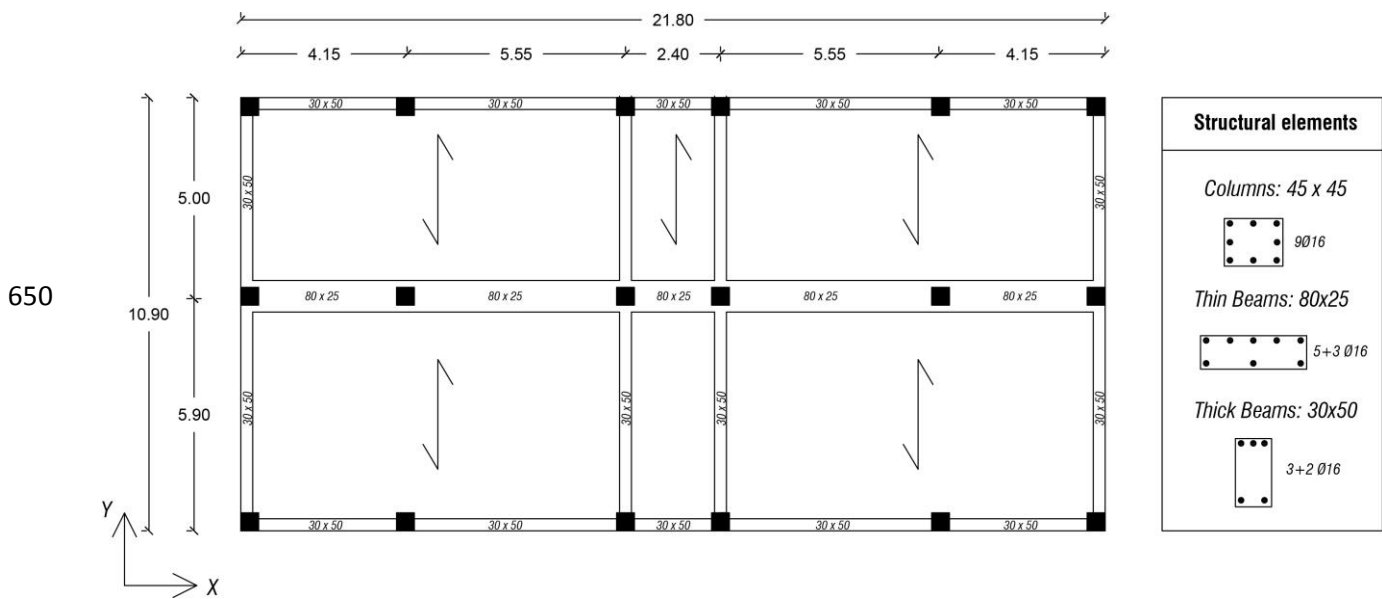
Structural scheme of the case study and detail of end sections of structural elements.
